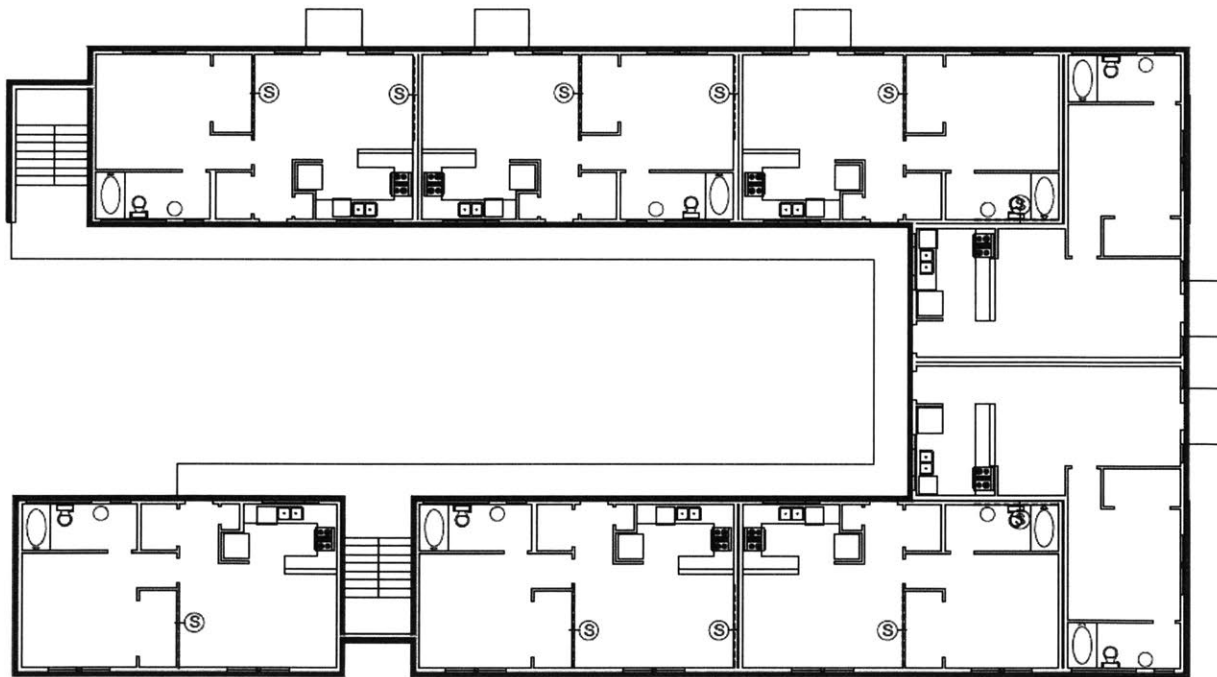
2nd Floor Plan – 8 One Bedroom Units (Graphic Provided by Owner)
